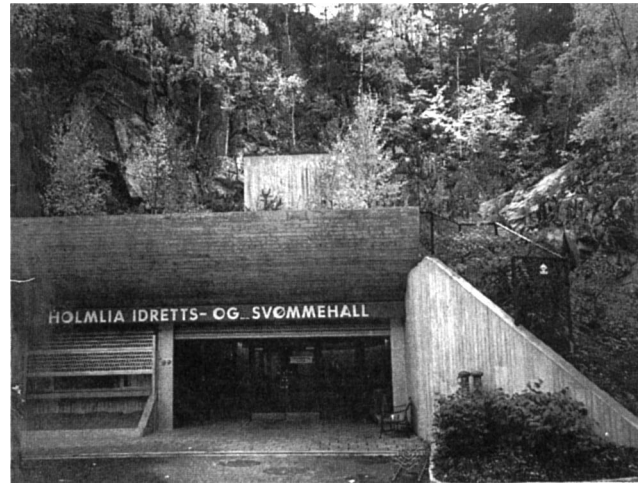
Entrance to underground civil defense and sports facility at Holmlia, Norway (photograph: D. Piepenburg).
